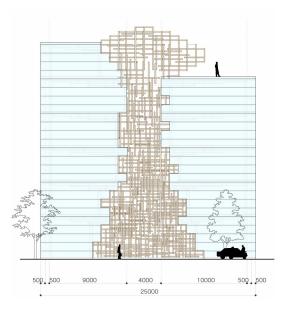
d – Elevation; Dimensions in [mm]
